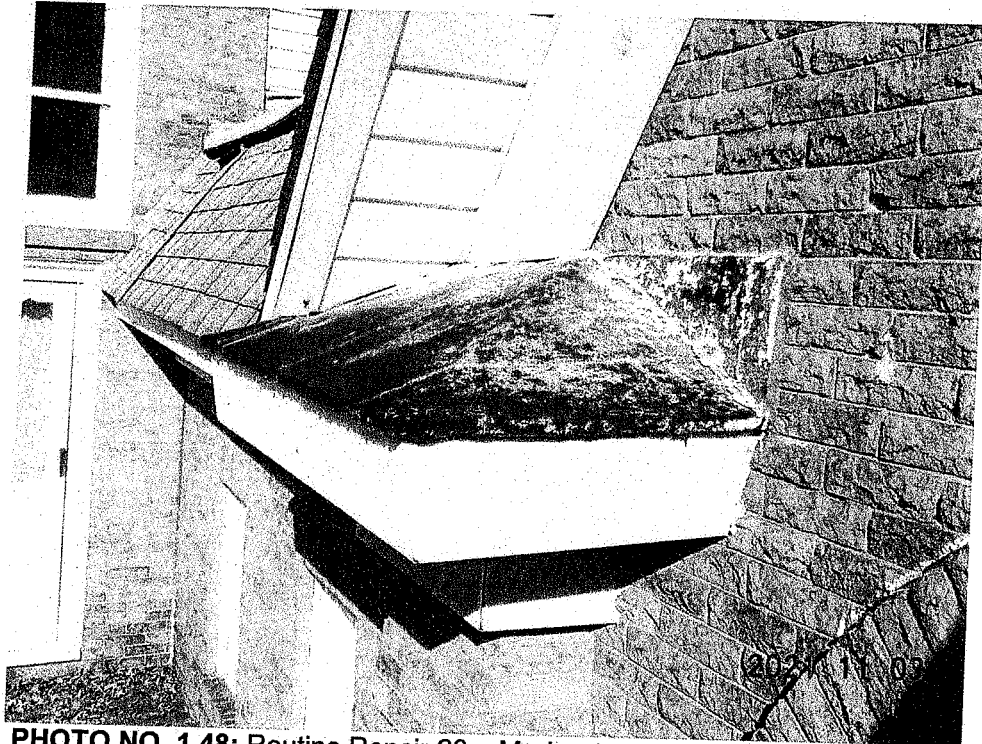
Routine Repair 23 – Moderate corrosion of sheet metal roof gable end returns with section loss – West Elevation, Grid G: Ht. 15' +/-
